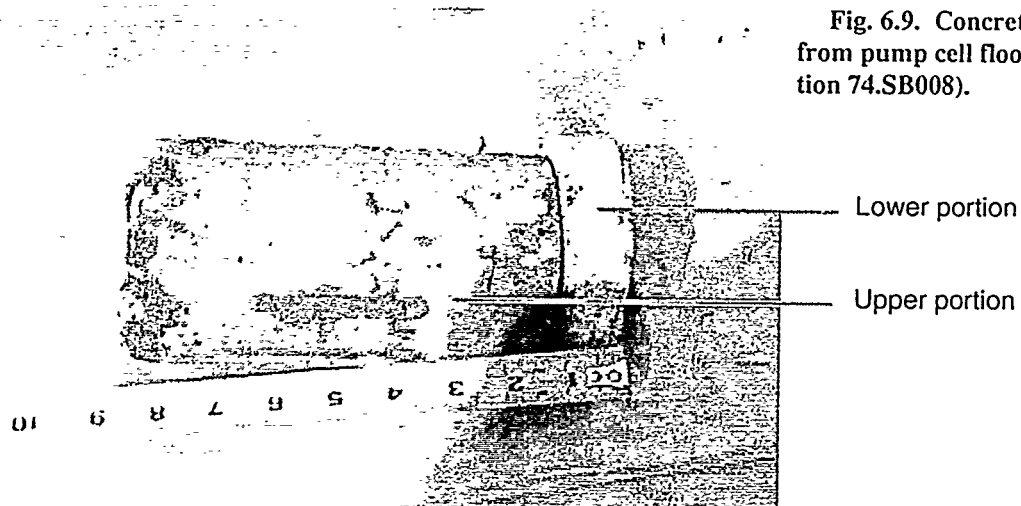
Concrete core from pump cell floor (location 74.SB008).
